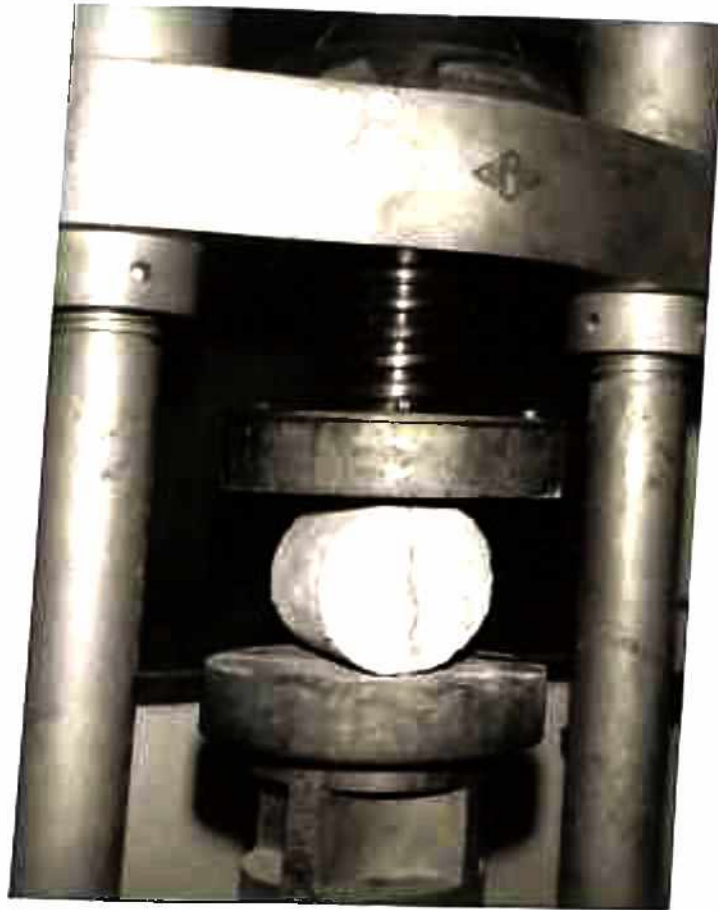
SAN FIBRE REINFORCED CONCRETE CYLINDER
